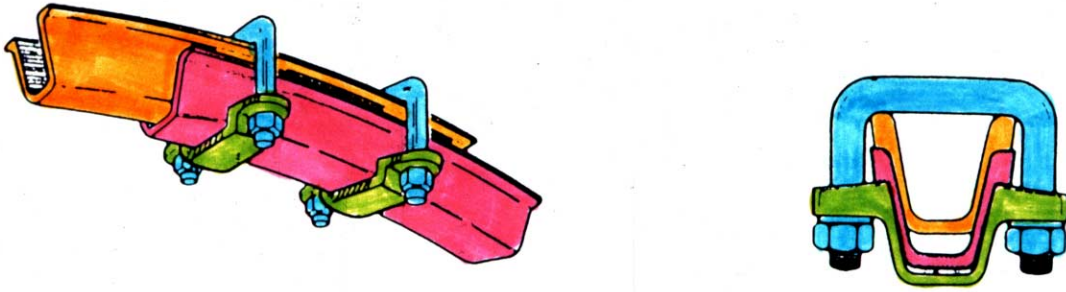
Assembly of a friction joint in a top hat section steel set.
